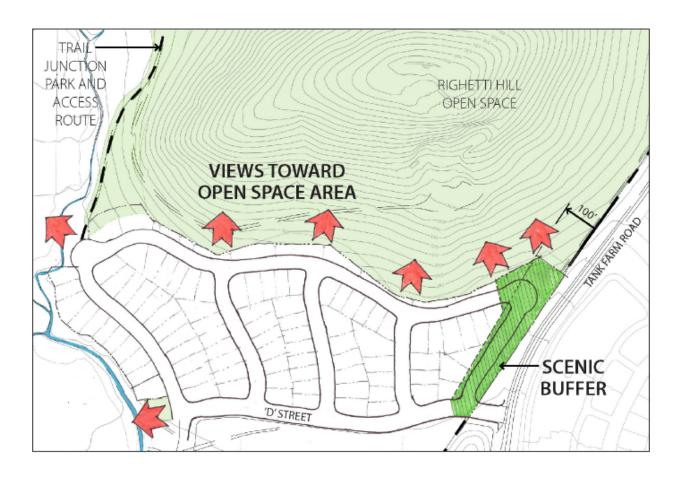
DIAGRAM OF STREET LAYOUT TO PRESERVE VIEWS OF RIGHETTI HILL
